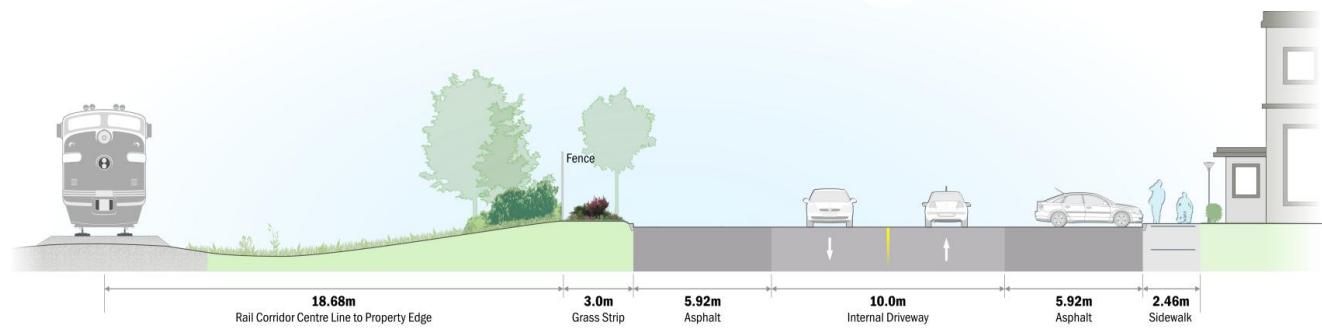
Development Cross-Section of the Proposed Fleet Parking Area (Parsons, 2025).
